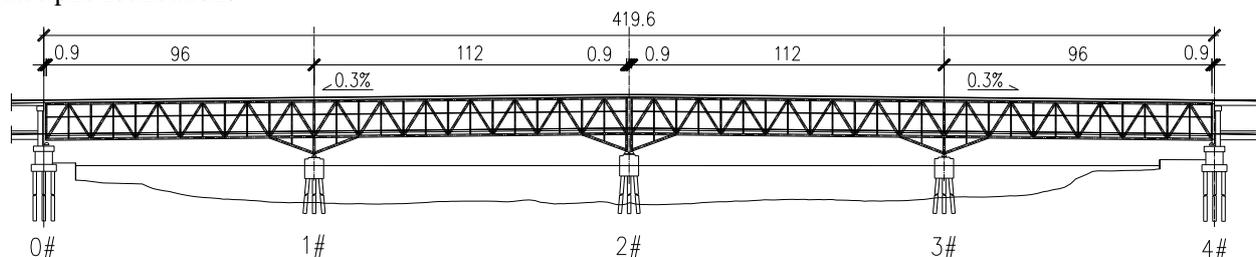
Elevation of the Main Bridge of the Songpu Bridge
